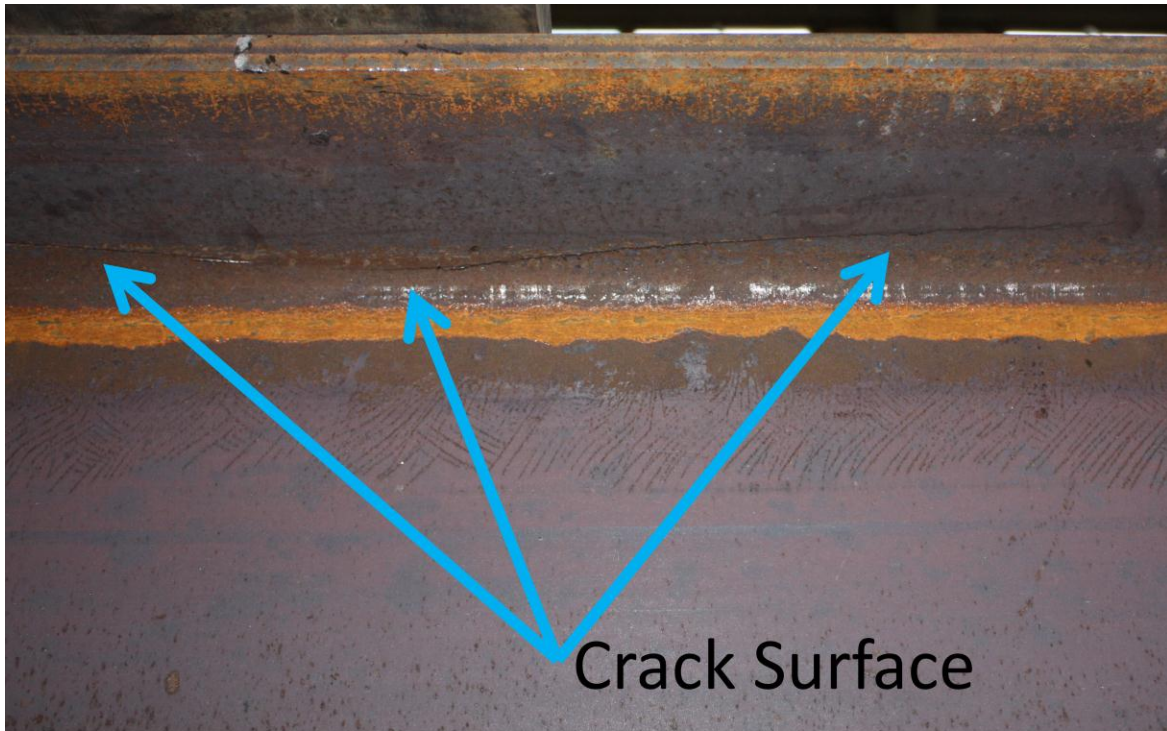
Location of Fatigue Crack on a Skewed Plate-Stiffener
